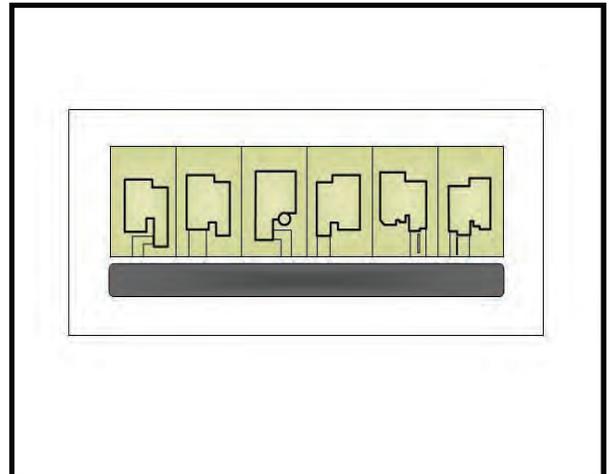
Façade Articulation Exhibit demonstrates a “staggered” street profile.
